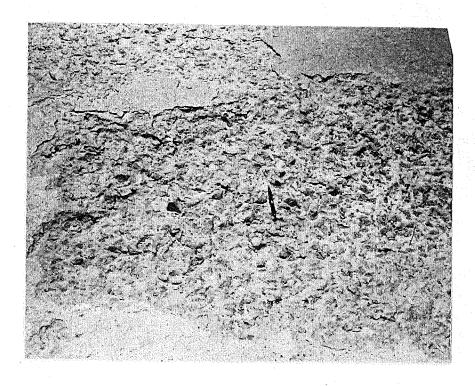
Close view showing depth of spalling. 34/00.
